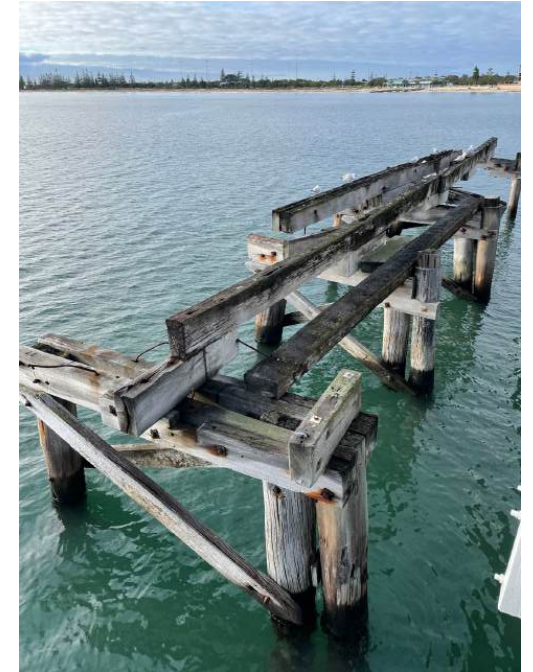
View of Interpretive Node #2 showing remaining timber jetty bents and stringer/rail beams affixed to half-caps. H+H Architects, 2022.
